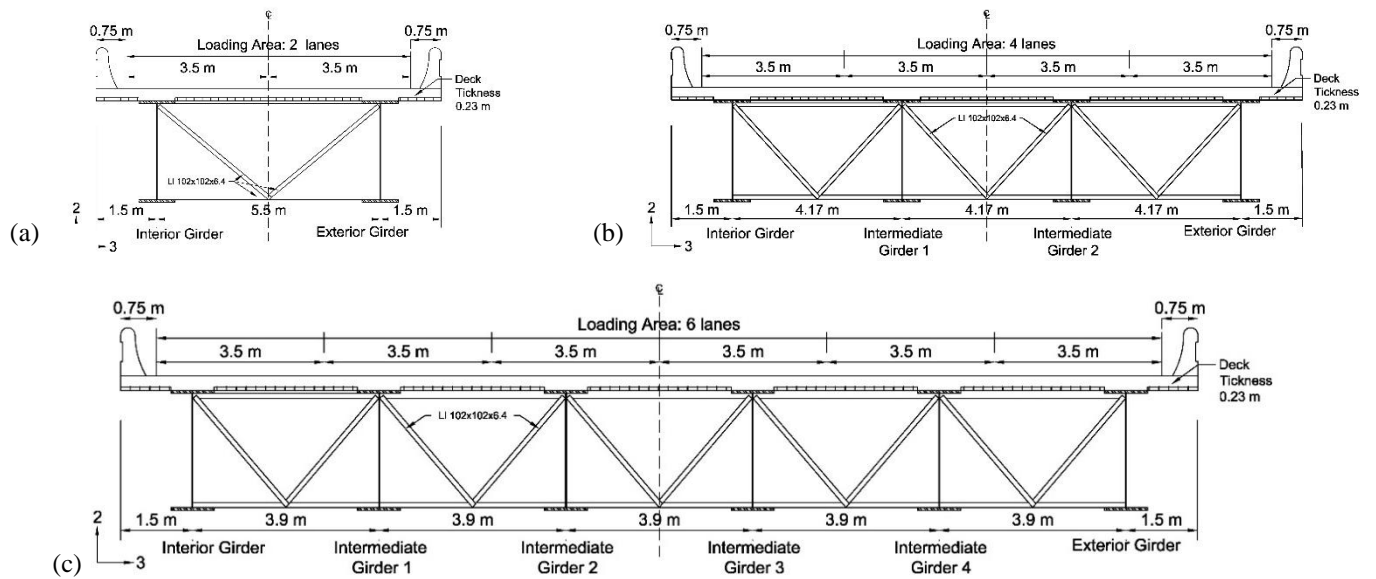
Bridge cross-sections used in the analyzed models: (a) bridge cross-section for models with 2 girders; (b) bridge cross-section for models with 4 girders; (c) bridge cross-section for models with 6 girders
